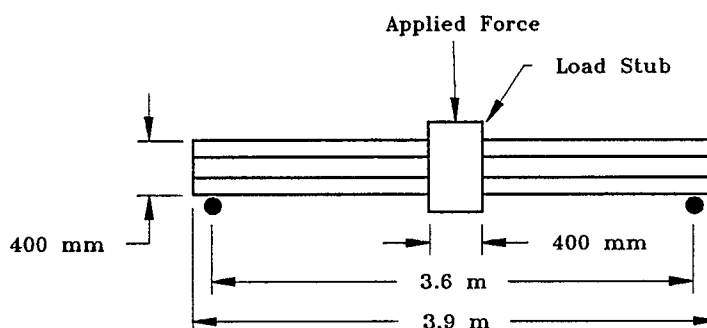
Pile test configuration described by Falconer and Park (drawn to scale; piles tested by Pam, Park, and Priestley were similar)
